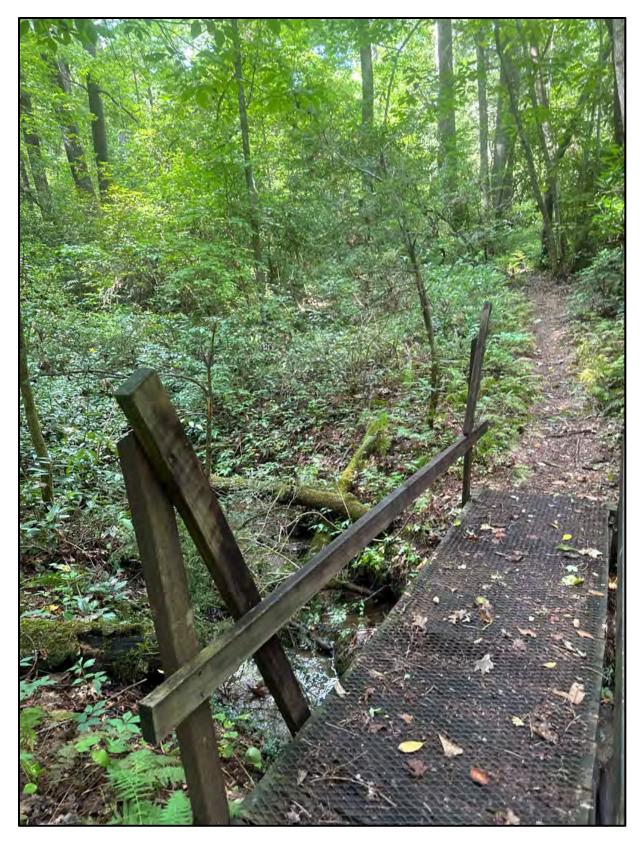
Trail Issue #8 - Coon Branch, Bridge/Bridge (see Figure 4.3)
